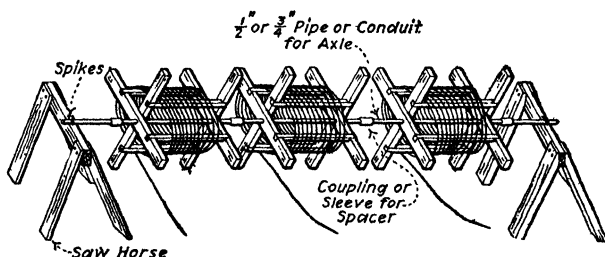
A multiple-reel arrangement used where three wires are being pulled in simultaneously. (One end wheel of each reel should be held in its reel with wood screws, so that it can be removed readily to provide for the mounting of a coil of wire.)
